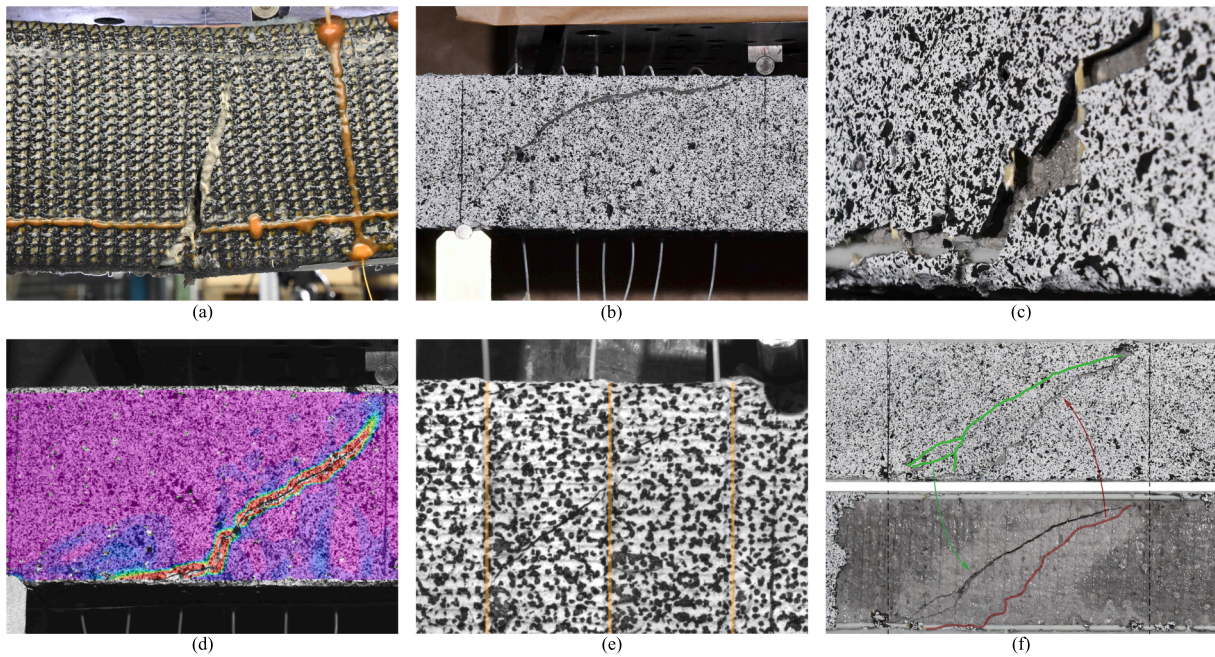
Crack and failure behaviour of specimens with textiles: (a) governing bending crack in ‘A-Ø08-s12’, (b) failure crack in textile (‘A-Ø12-s30b’), (c) rupture of aramid inlays and base textile (‘A-Ø12-s20b’), (d) crack in textile at ultimate load (before collapse) in ‘T-Ø12’, (e) crack formation in base textile between two adjacent aramid inlays, denoted as yellow lines (‘A-Ø08-s50’), (f) failure crack in textile (red) and governing shear crack in concrete (green) determined after stripping the textile (‘A-Ø12-s30b’).
